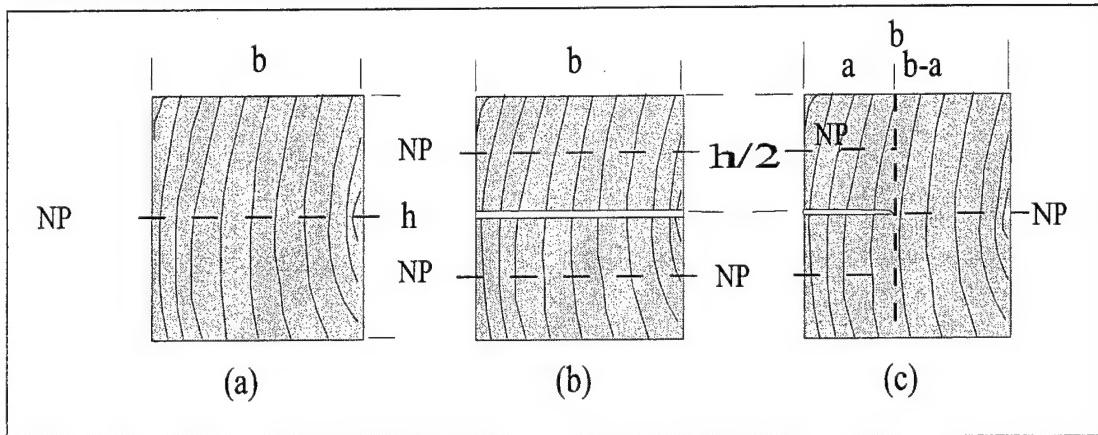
Effect of separation on cross-sectional properties of beam: (a) solid section, (b) split at neutral plane, (c) check at neutral plane.
